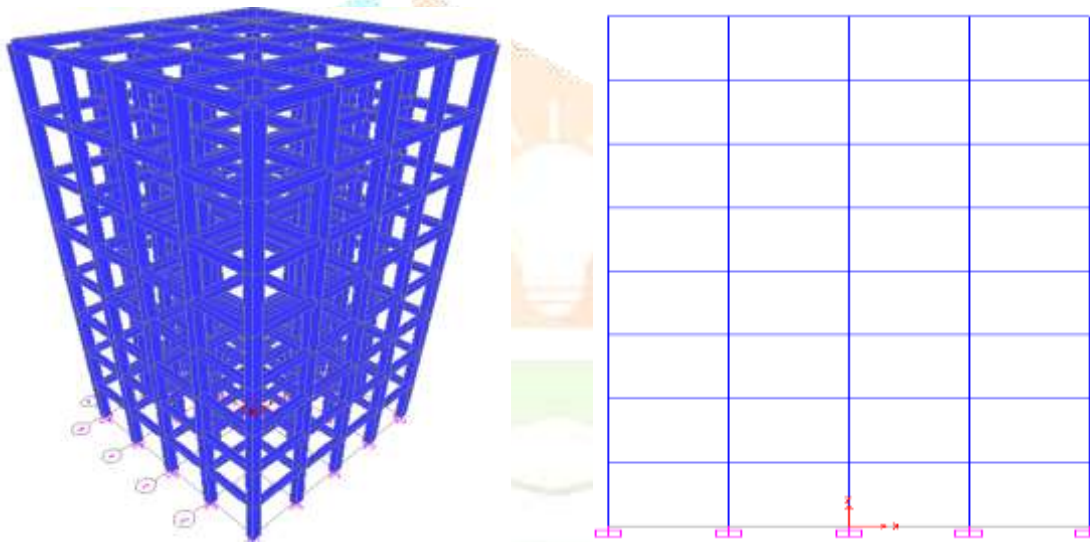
3-D and Elevation View of Bare Frame Structure
